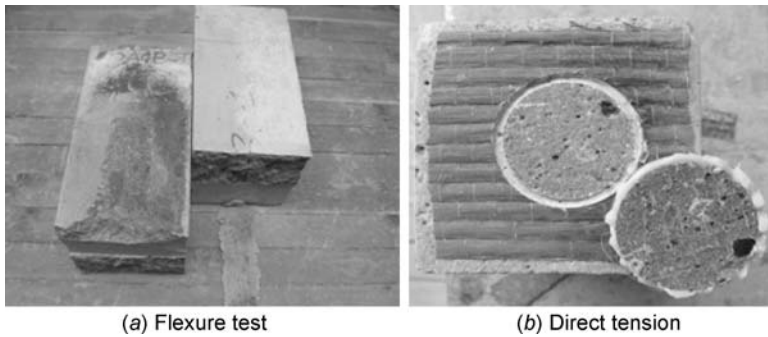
Adhesive failure mode. (a) Flexure test. (b) Direct tension test.
